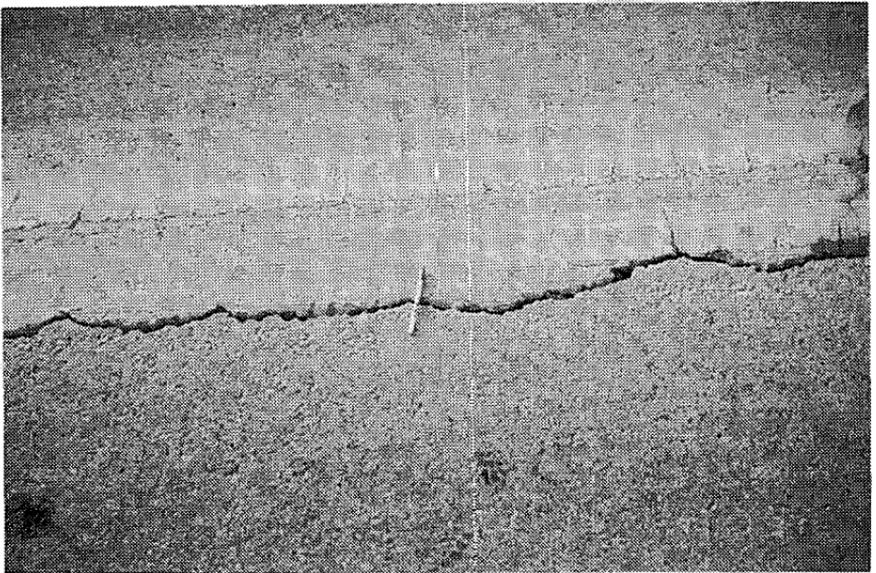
Pavement candidate for longitudinal crack filling
